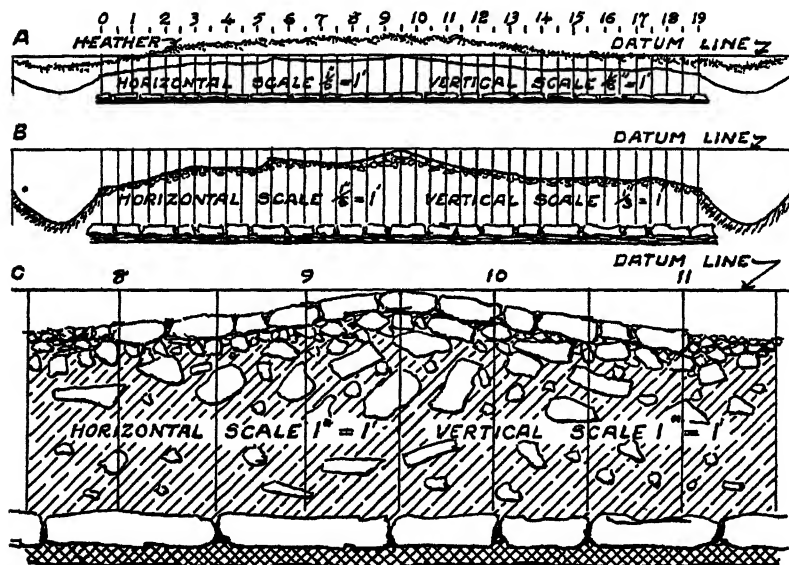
CROSS-SECTIONS OF ROMAN ROAD SOUTH OF COLLIELAW FARM-STEADING
